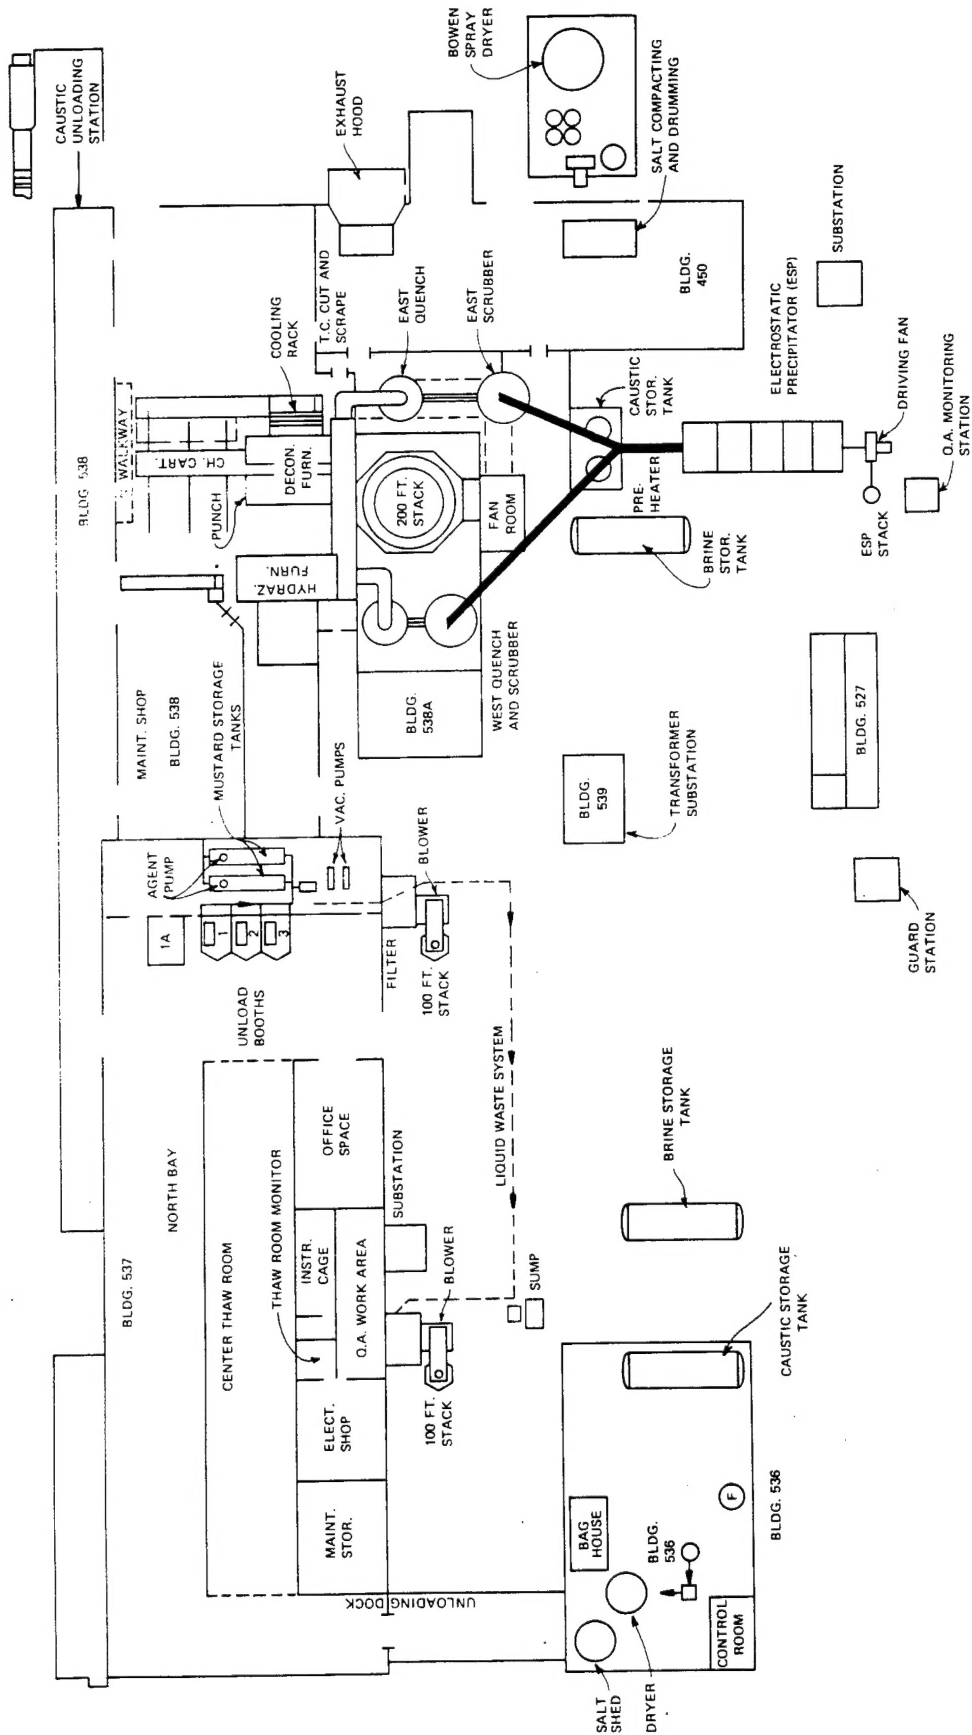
PLANT LAYOUT - MUSTARD DISPOSAL FACILITY, ROCKY MOUNTAIN ARSENAL - AS OF 1 NOV., 1973
